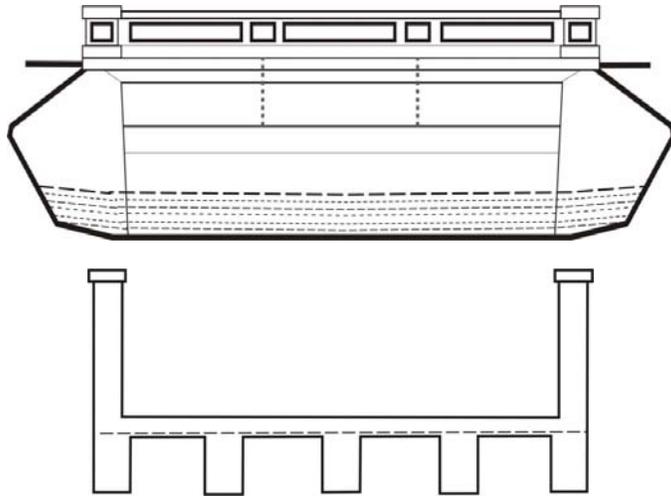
Drawings of elevation and section of concrete girder. Adapted from Maryland State Roads Commission’s 1919 “Standard Girder Bridges General Plan.”
